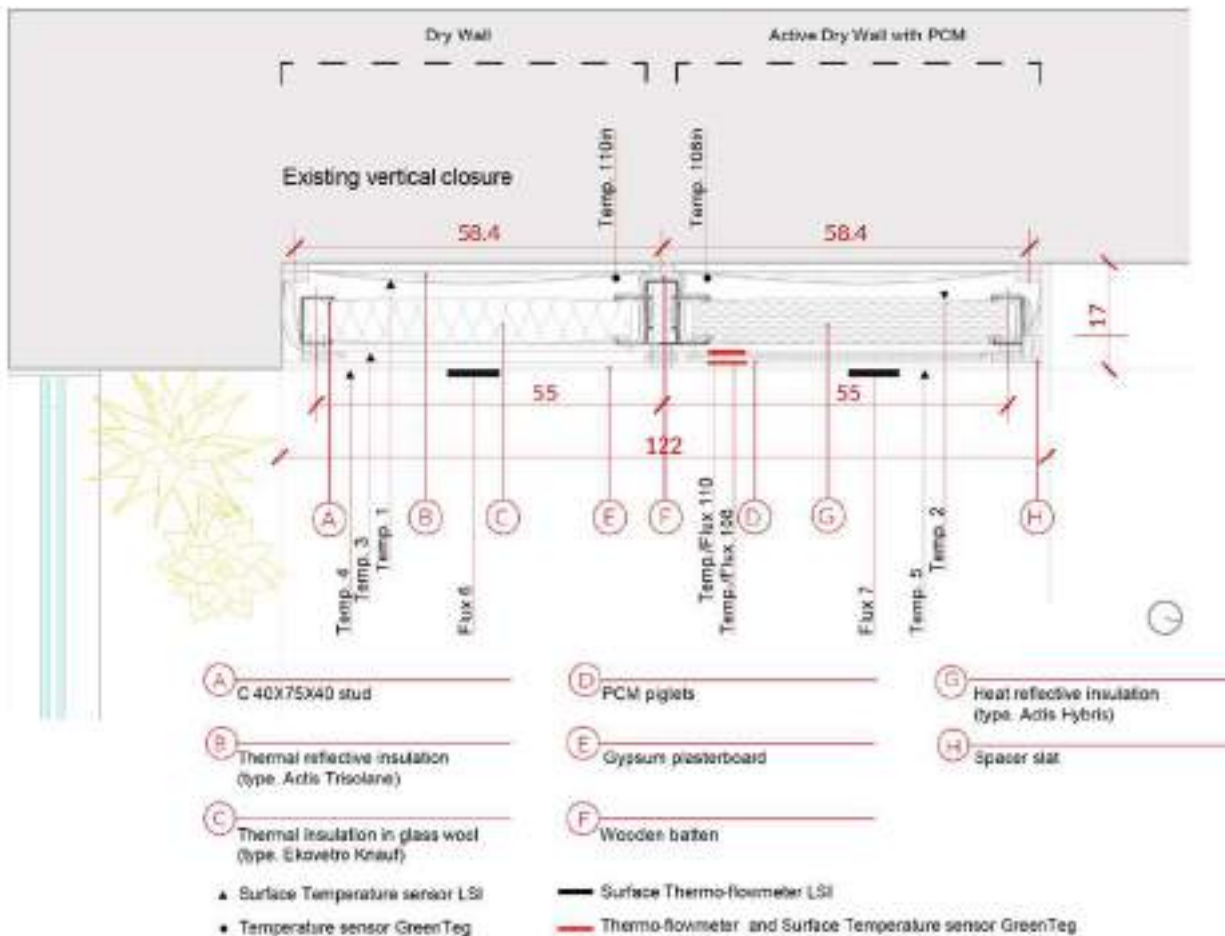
The horizontal section of the Dry Wall on the left side and the Active Dry Wall on the right one, installed on the south side of the east wing of VELUXlab, highlighting the sensor's location and the technology layers' composition. The two false-walls are detached from the existing vertical closure thanks to a vertical insulation layer (B) and the wooden batten (F).
